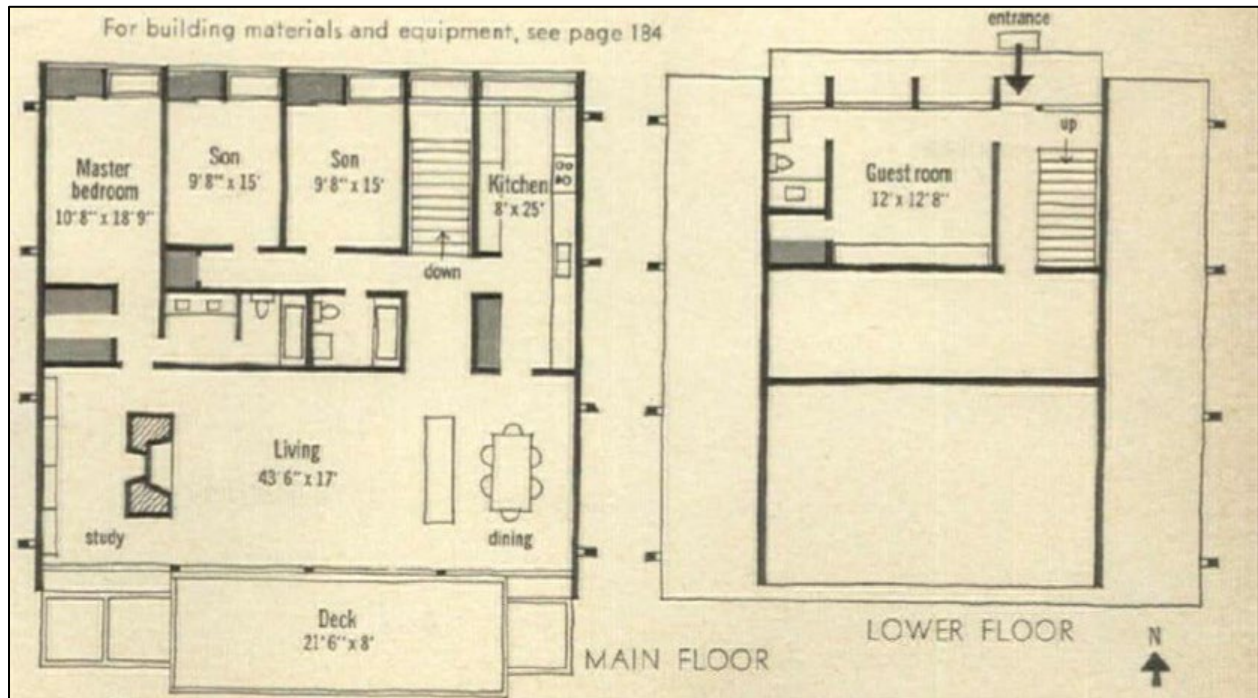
Plan of 188 Chichester Road from *House and Garden*, May 1967.
